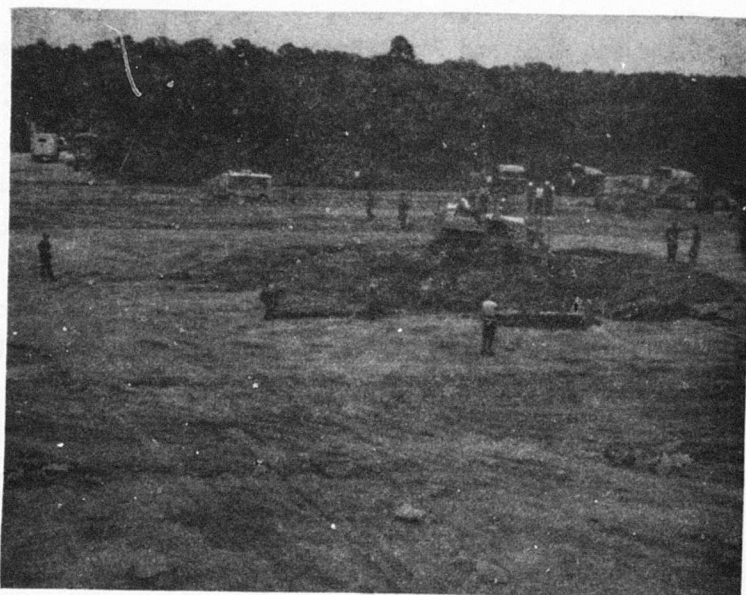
Test 1-1, TD 20 Lifting and Breaking Free Large Upheaved Pavement Sections
